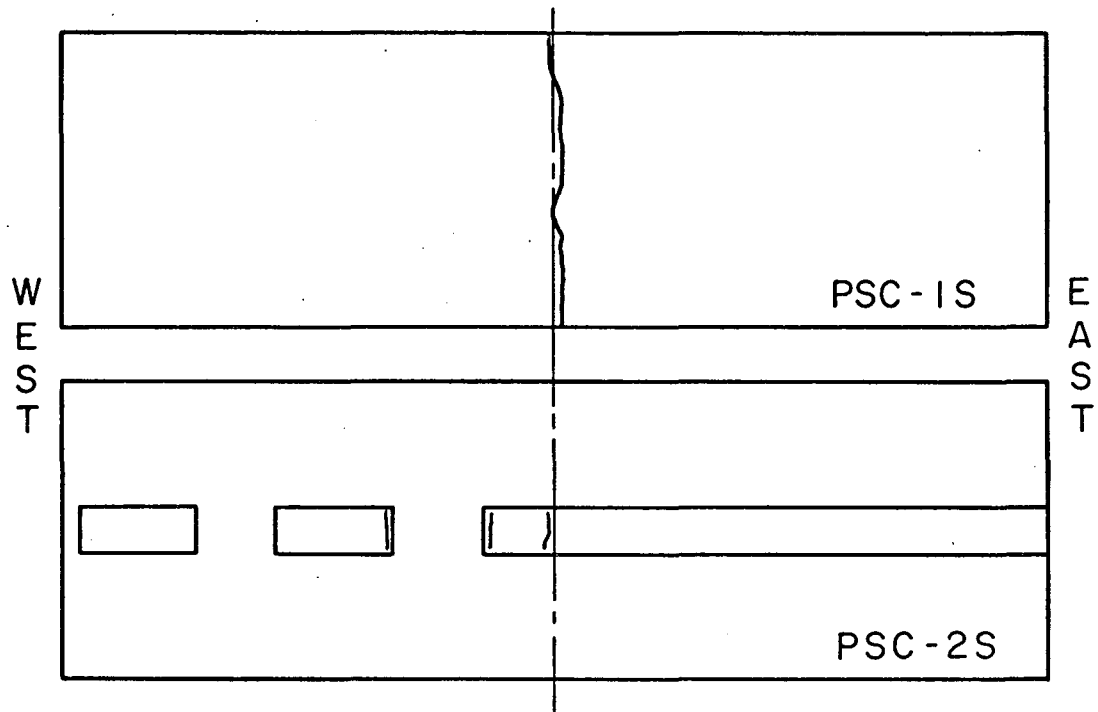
SLAB CRACKING AT 90 KIPS
